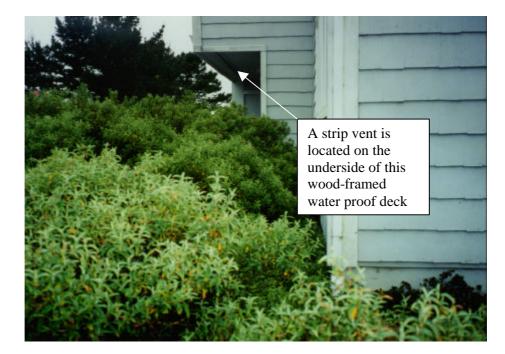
The strip vents commonly used in woof-framed waterproof decks are subject to the same flame and ember entry problems as crawlspace and attic vents. In this case, vegetation growing under the deck increases the potential danger to the structure.
